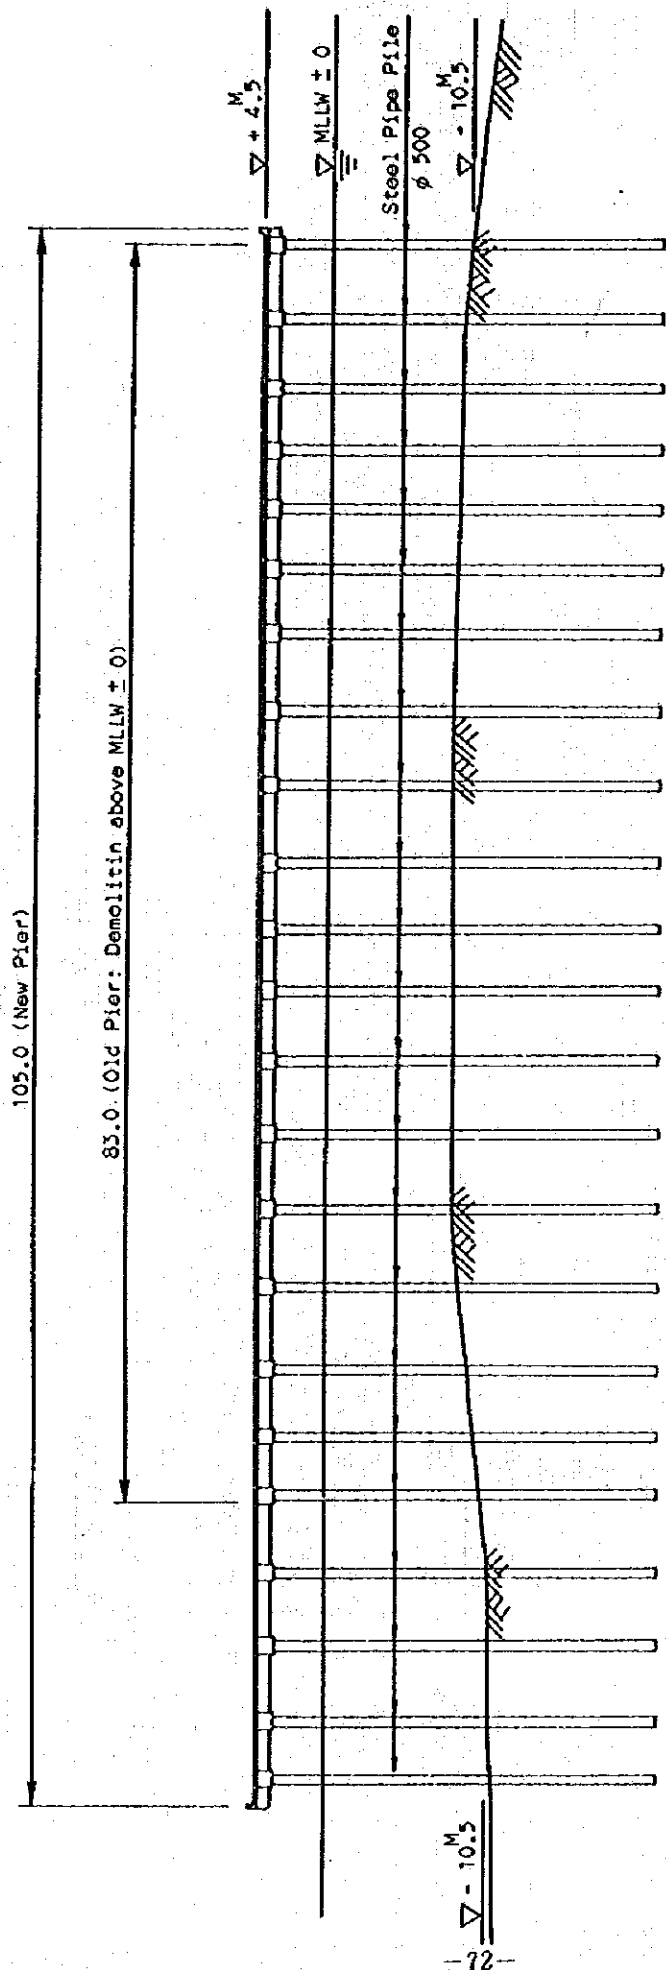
Proposed Section for Pier 13 (Alternative 4)
